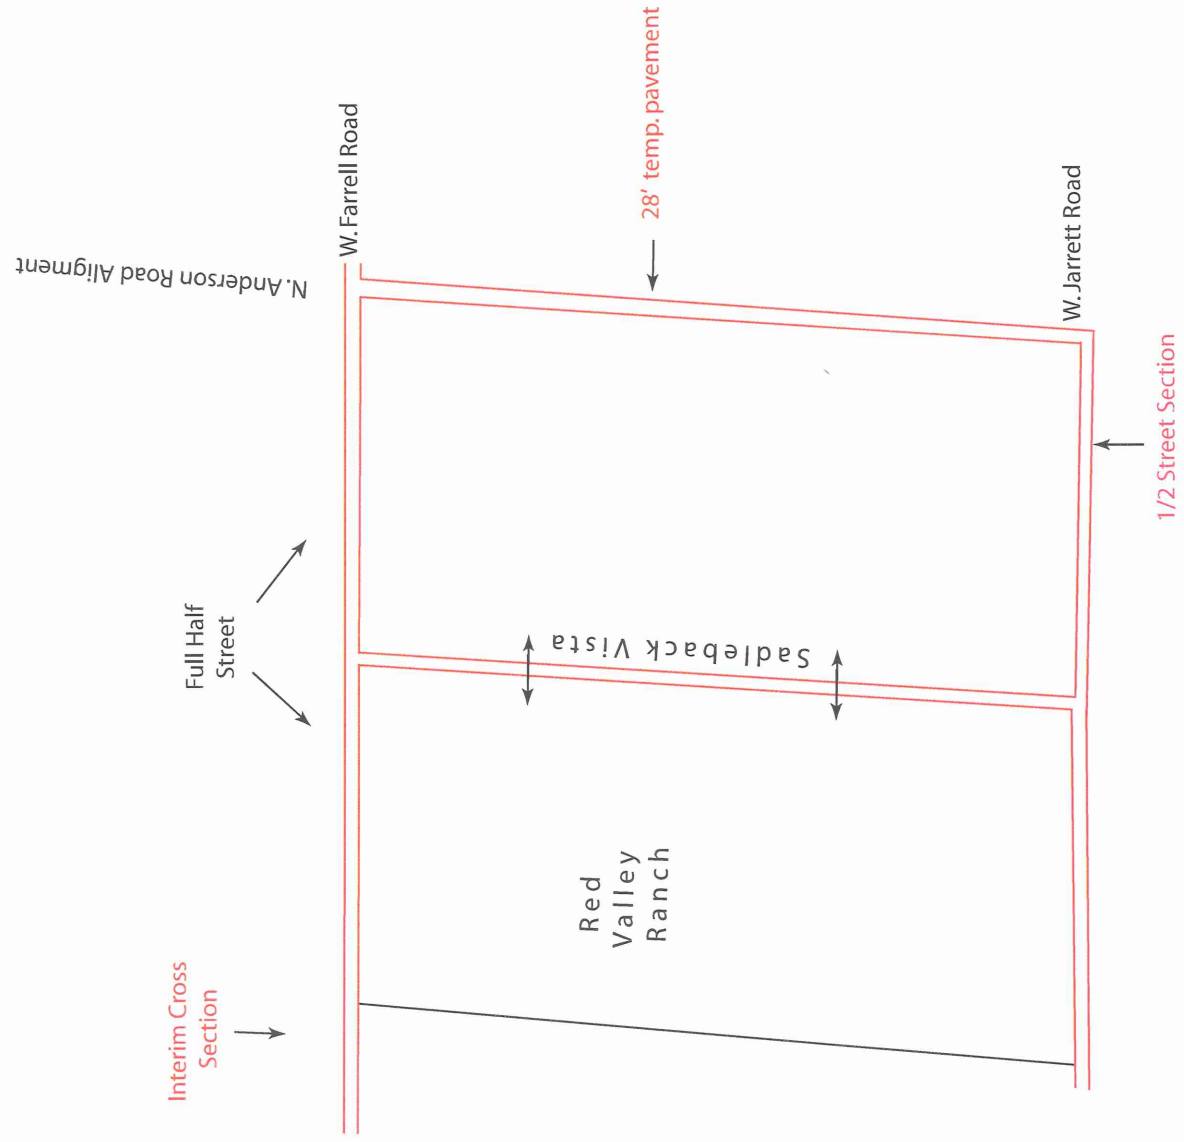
is the recommended site plan for Red Valley Ranch. The proposed site is bound by Farrell Road on the north, Anderson Road alignment on the east, Jarrett Road alignment to the south. It is bounded by an MSID canal on the west located at the half mile alignment between Murphy Road and Anderson Road.
